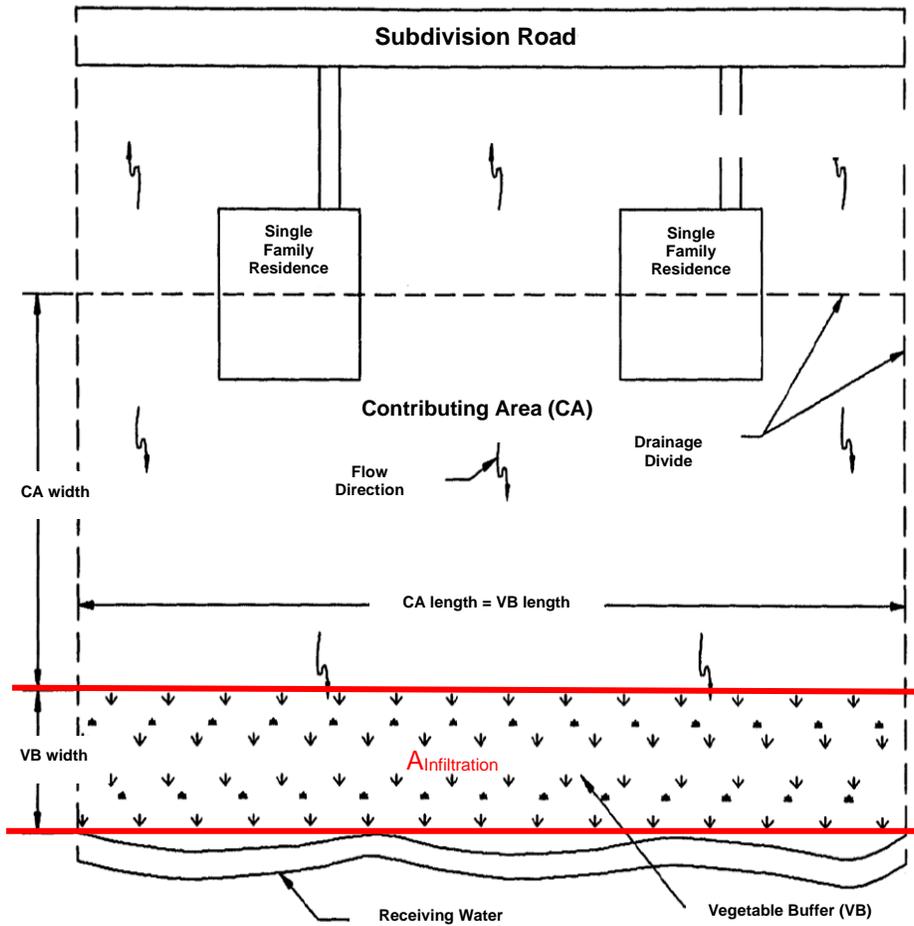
Plan View Schematic of a Typical Vegetated Buffers
